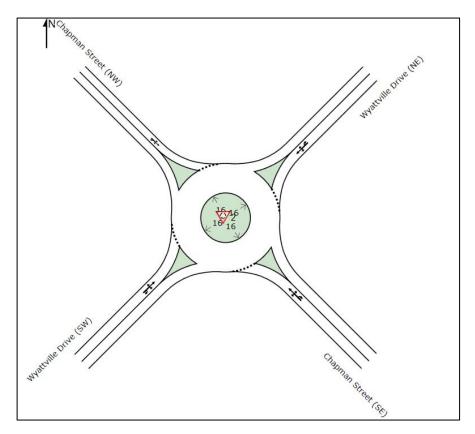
Chapman Street / Wyattville Drive roundabout SIDRA layout
